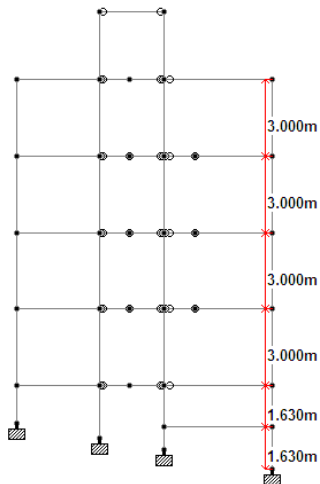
Elevation of residential building on 10 deg. Slope
